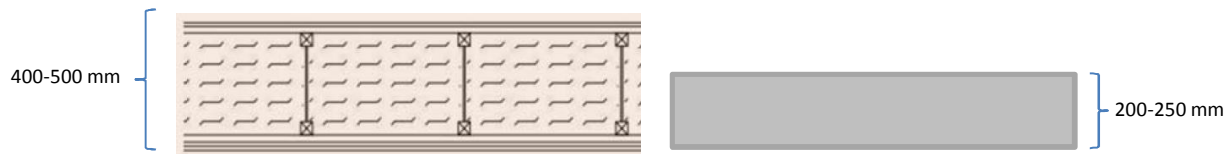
Structural bearing system and their dimensions. Left; wood. Right; concrete. Approximate structural floor height for a typical wood structure (left) and heavy concrete structure (right) to fulfil minimum requirements in Swedish building regulations.
